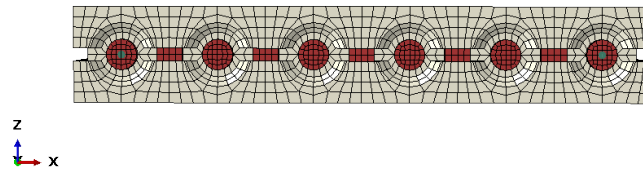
Detail of grout/reinforcement layout in the slender wall assembly.
